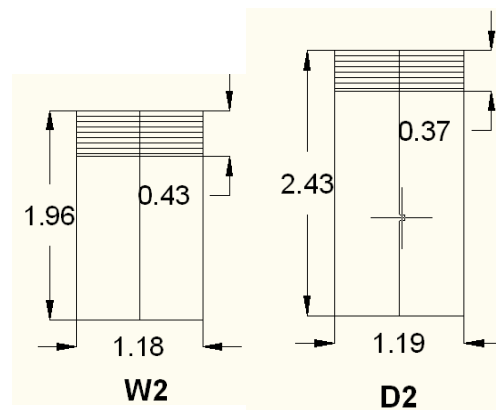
Dimensions and the details of the openings (All the dimensions are in meters)
